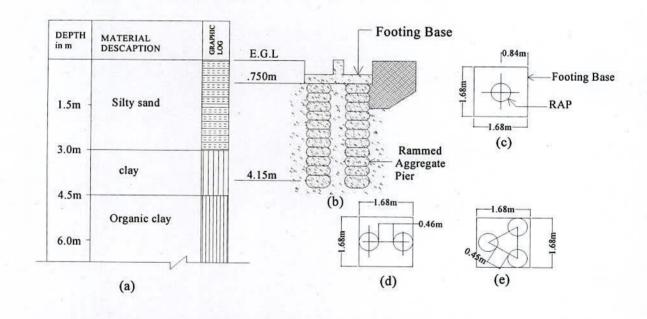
Different arrangements of RAP: (a) sub-soil profile, (b) section of installed RAP under footing, (c) plan of single RAP (d) plan of double RAP (d) plan of group RAP.
